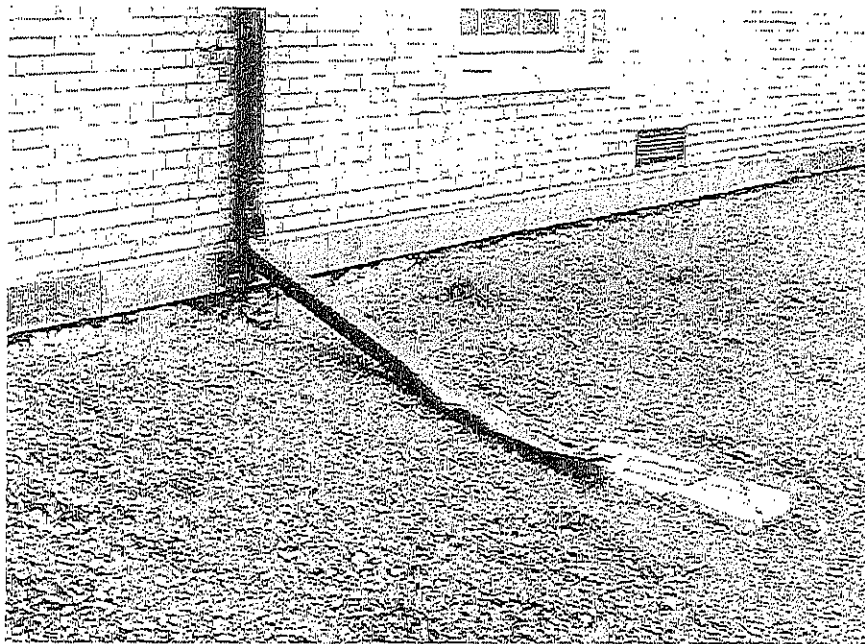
A crushed leader extension on the north wall has the potential of causing roof run-off water to back-up in the leader and water infiltration. Note water and rust staining behind the leader on the brick.
